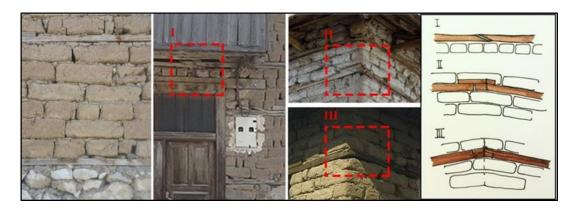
First photo shows a part from the mud brick masonry wall; the last three photo and the sketch show the point of junctions of two lintels, called as 'hatil'. Photos are from H15.
